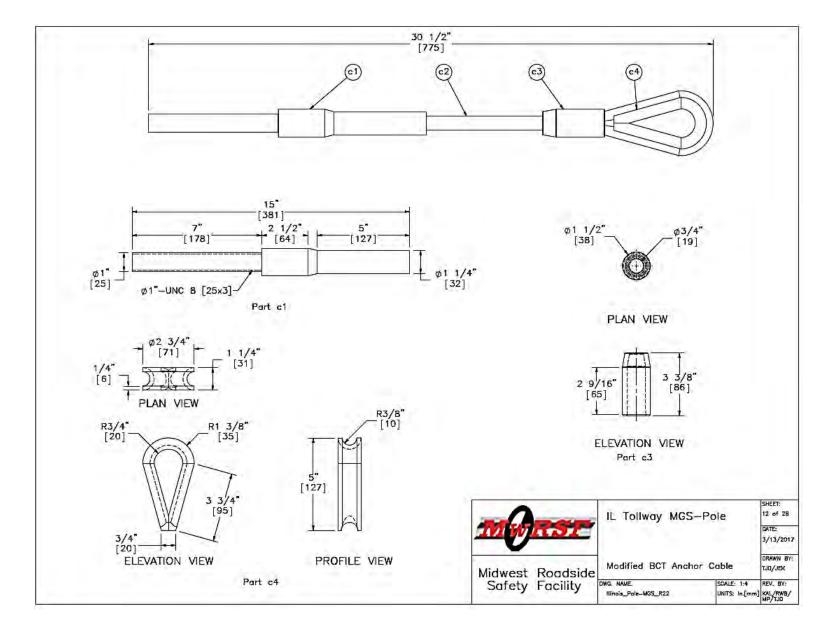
Modified BCT Anchor Cable, Test No. ILT-1
